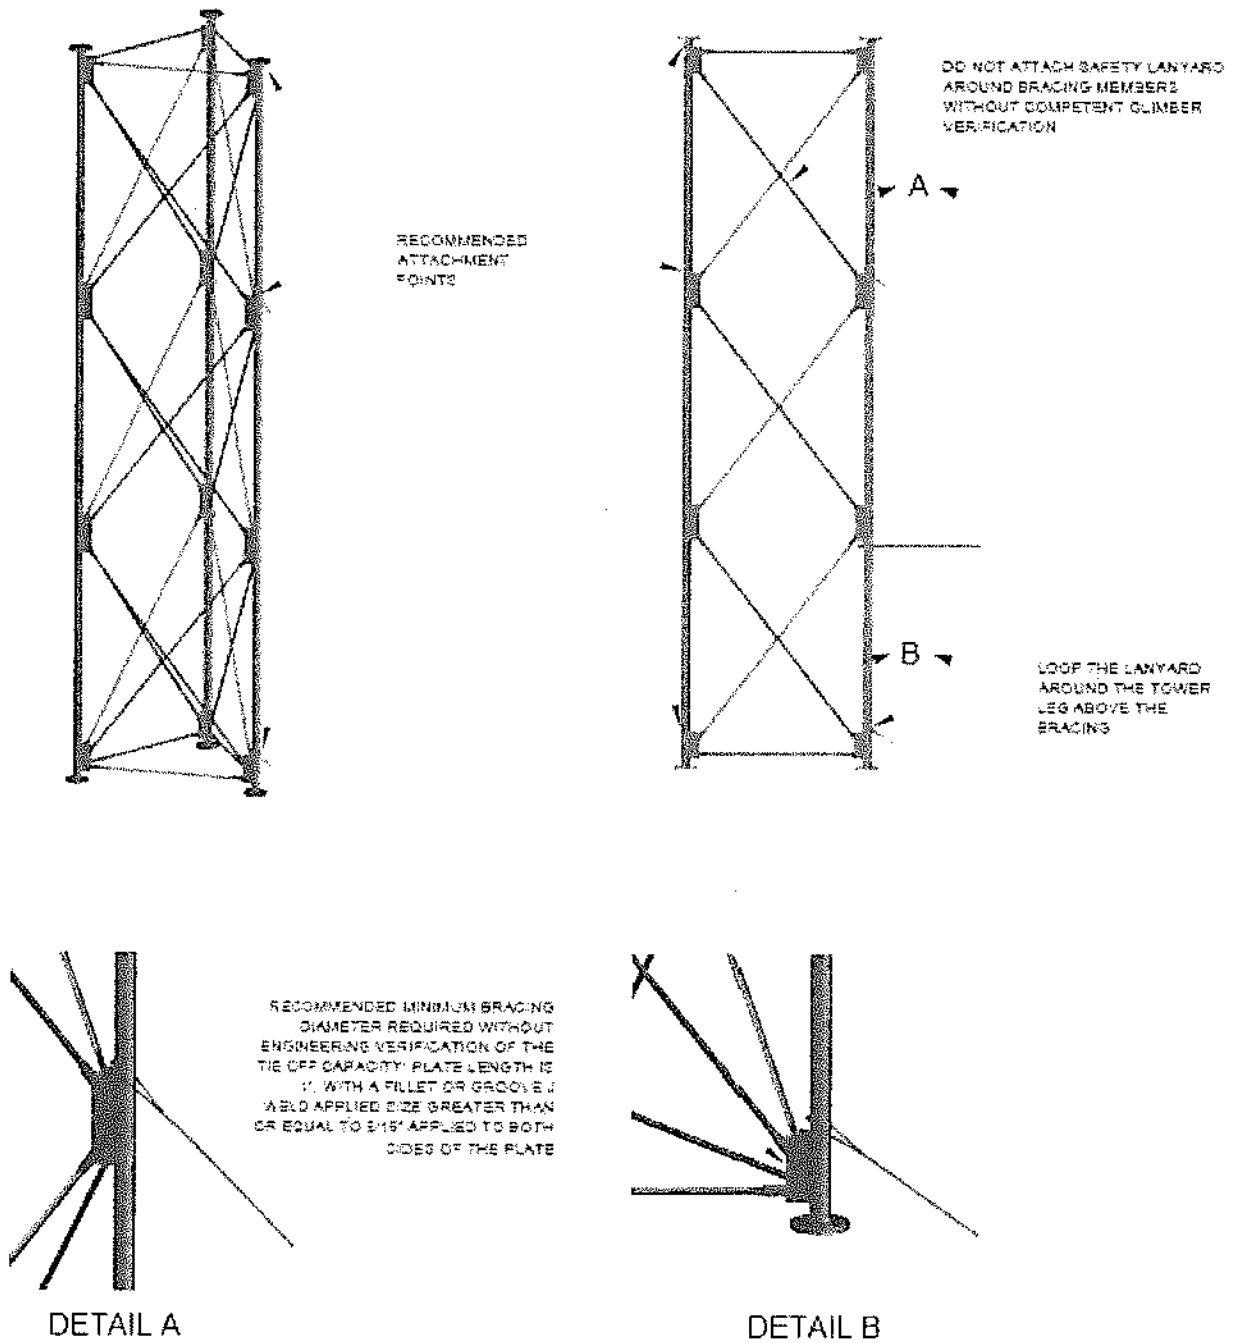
Examples of Climber Attachment Anchorages (Bolted Sections)
